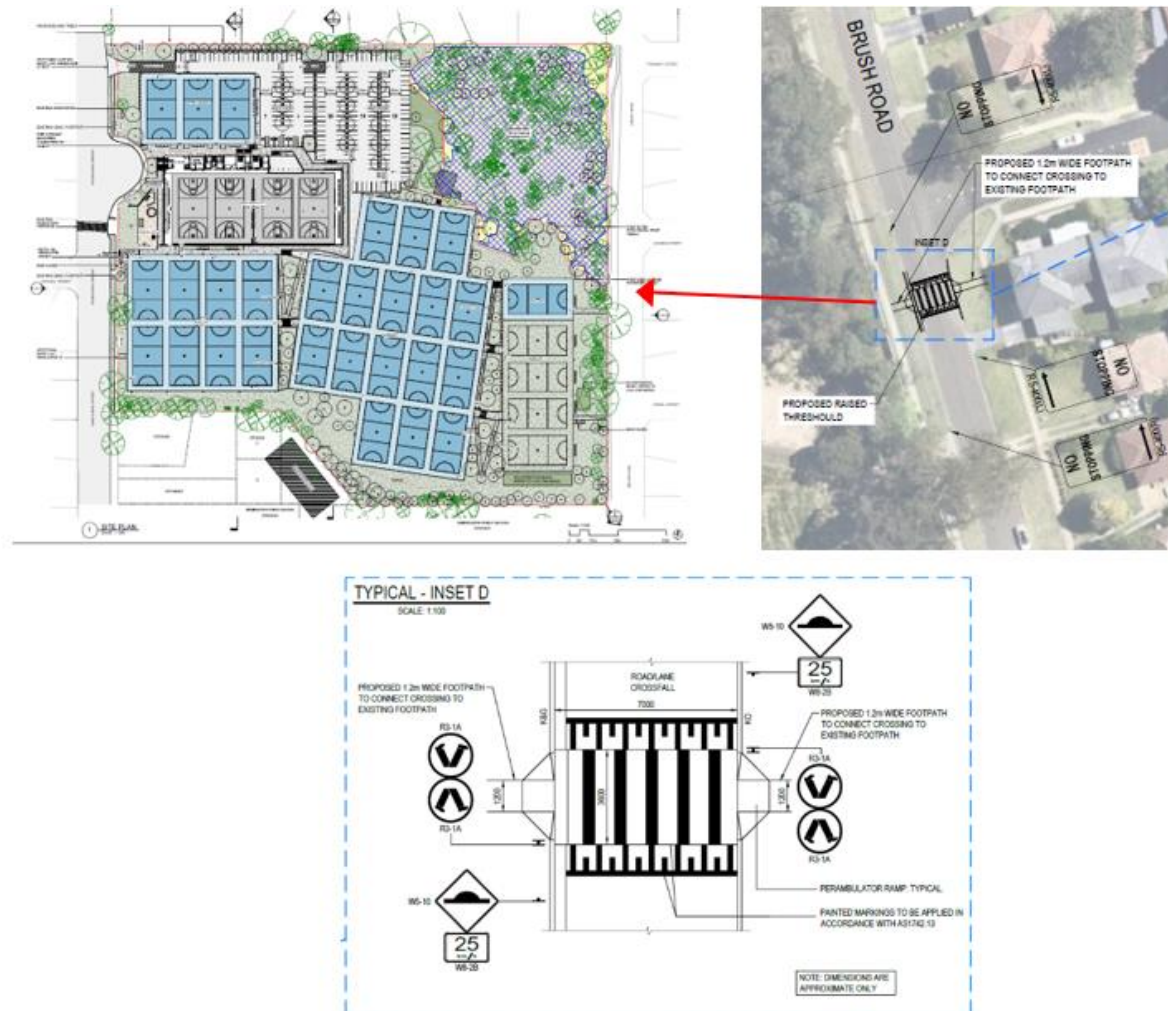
Extract from the Civil and Public Domain Plan showing the location of the proposed raised pedestrian crossing to Brush Road to link to the existing pathways.
